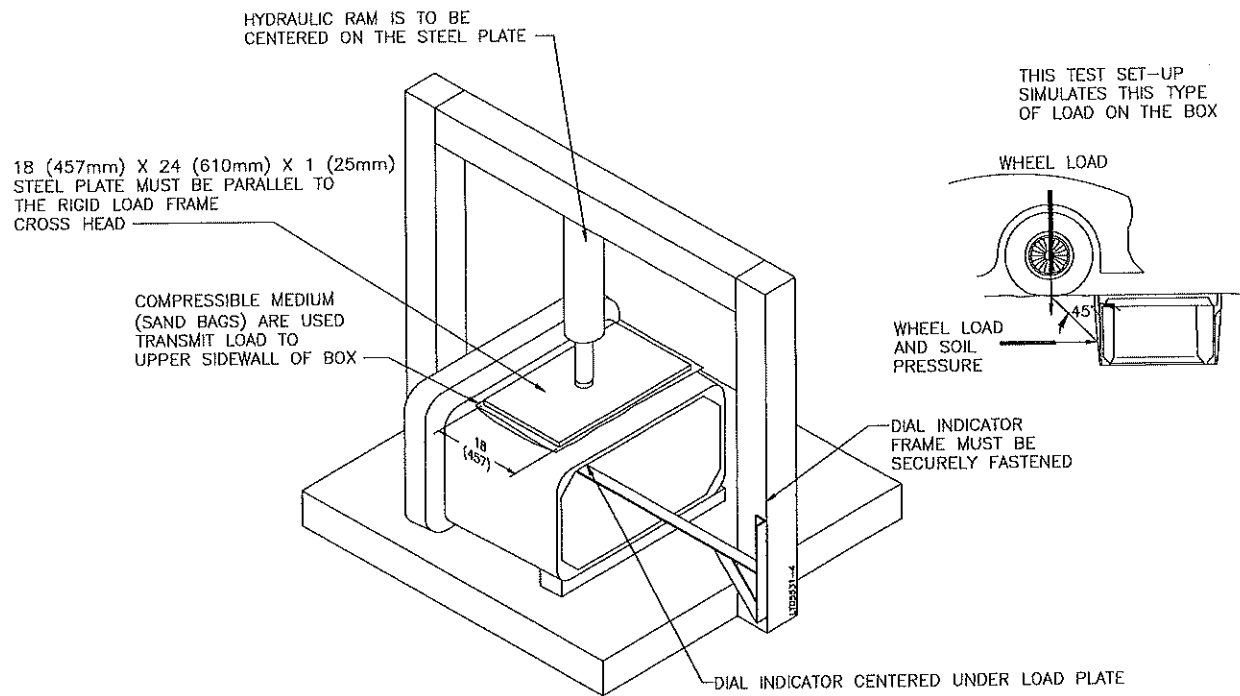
Box Vertical Sidewall Load Test (Tier 22)
